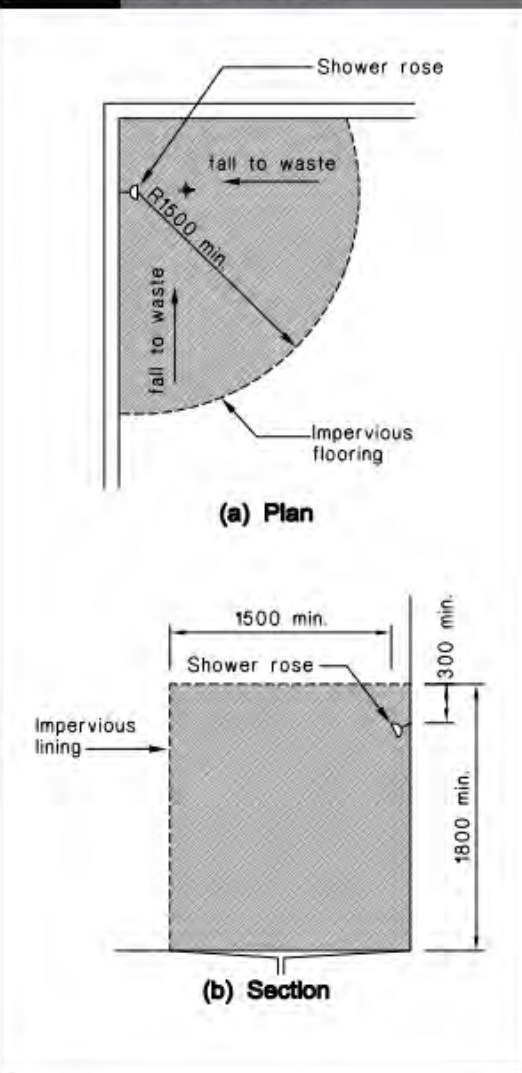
Wall and Floor Coverings to Unenclosed Showers
